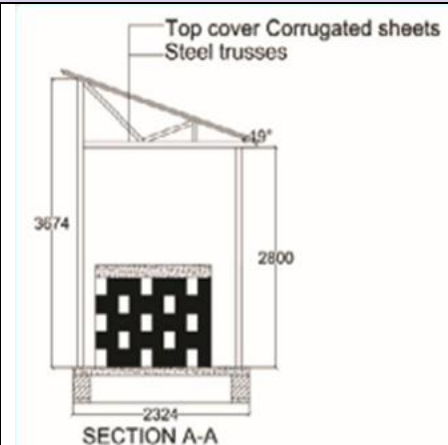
Sectional view (A–A) showing ventilation blocks, 2800 mm wall height, and roof slope.
